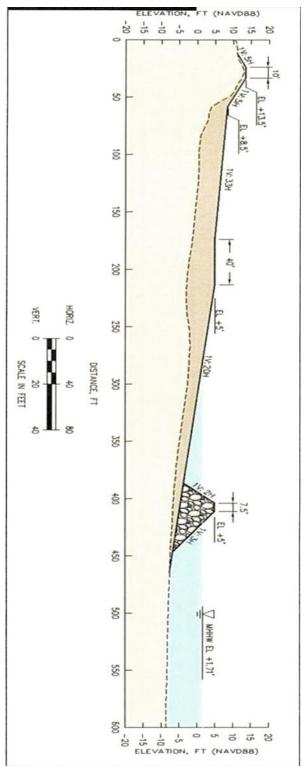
Typical cross-section through the proposed beach/dune nourishment area and one of the previously constructed breakwater features. Darker brown shading indicates the sand that would be added for restoration/renourishment purposes
